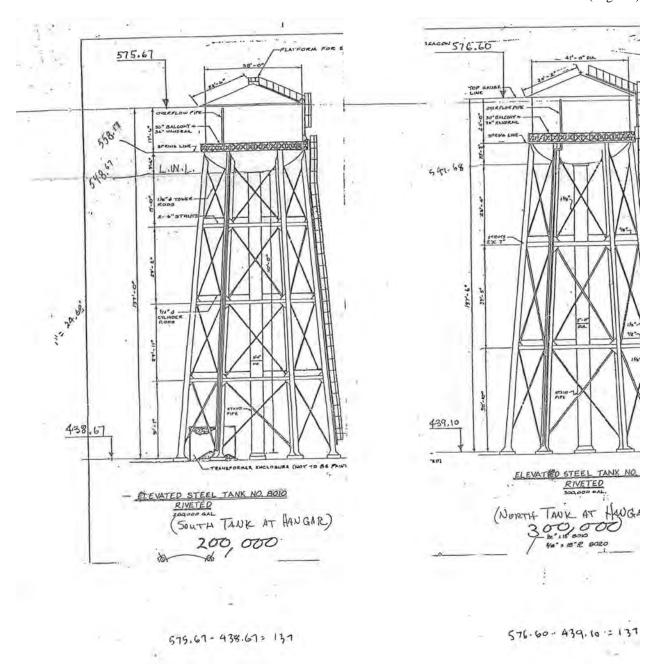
Undated sketch plans of Water Towers 8010 and 8020. Credit: American Water MSG.
